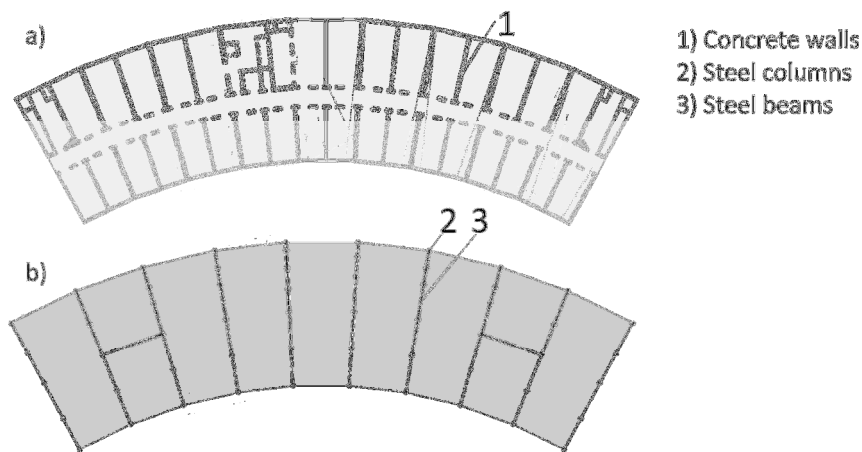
, Illustration of plans in Scandic Opalen: a) storey in original building, b) storey in extension.
